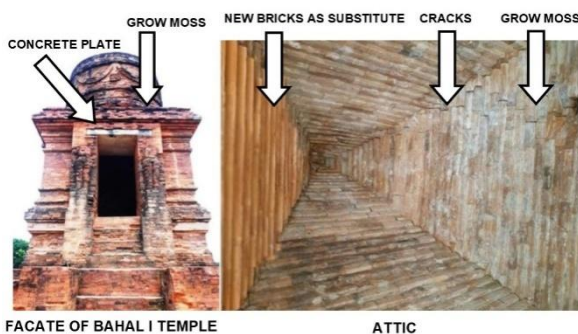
The use of concrete plate (left) and the damage of temples' attic
